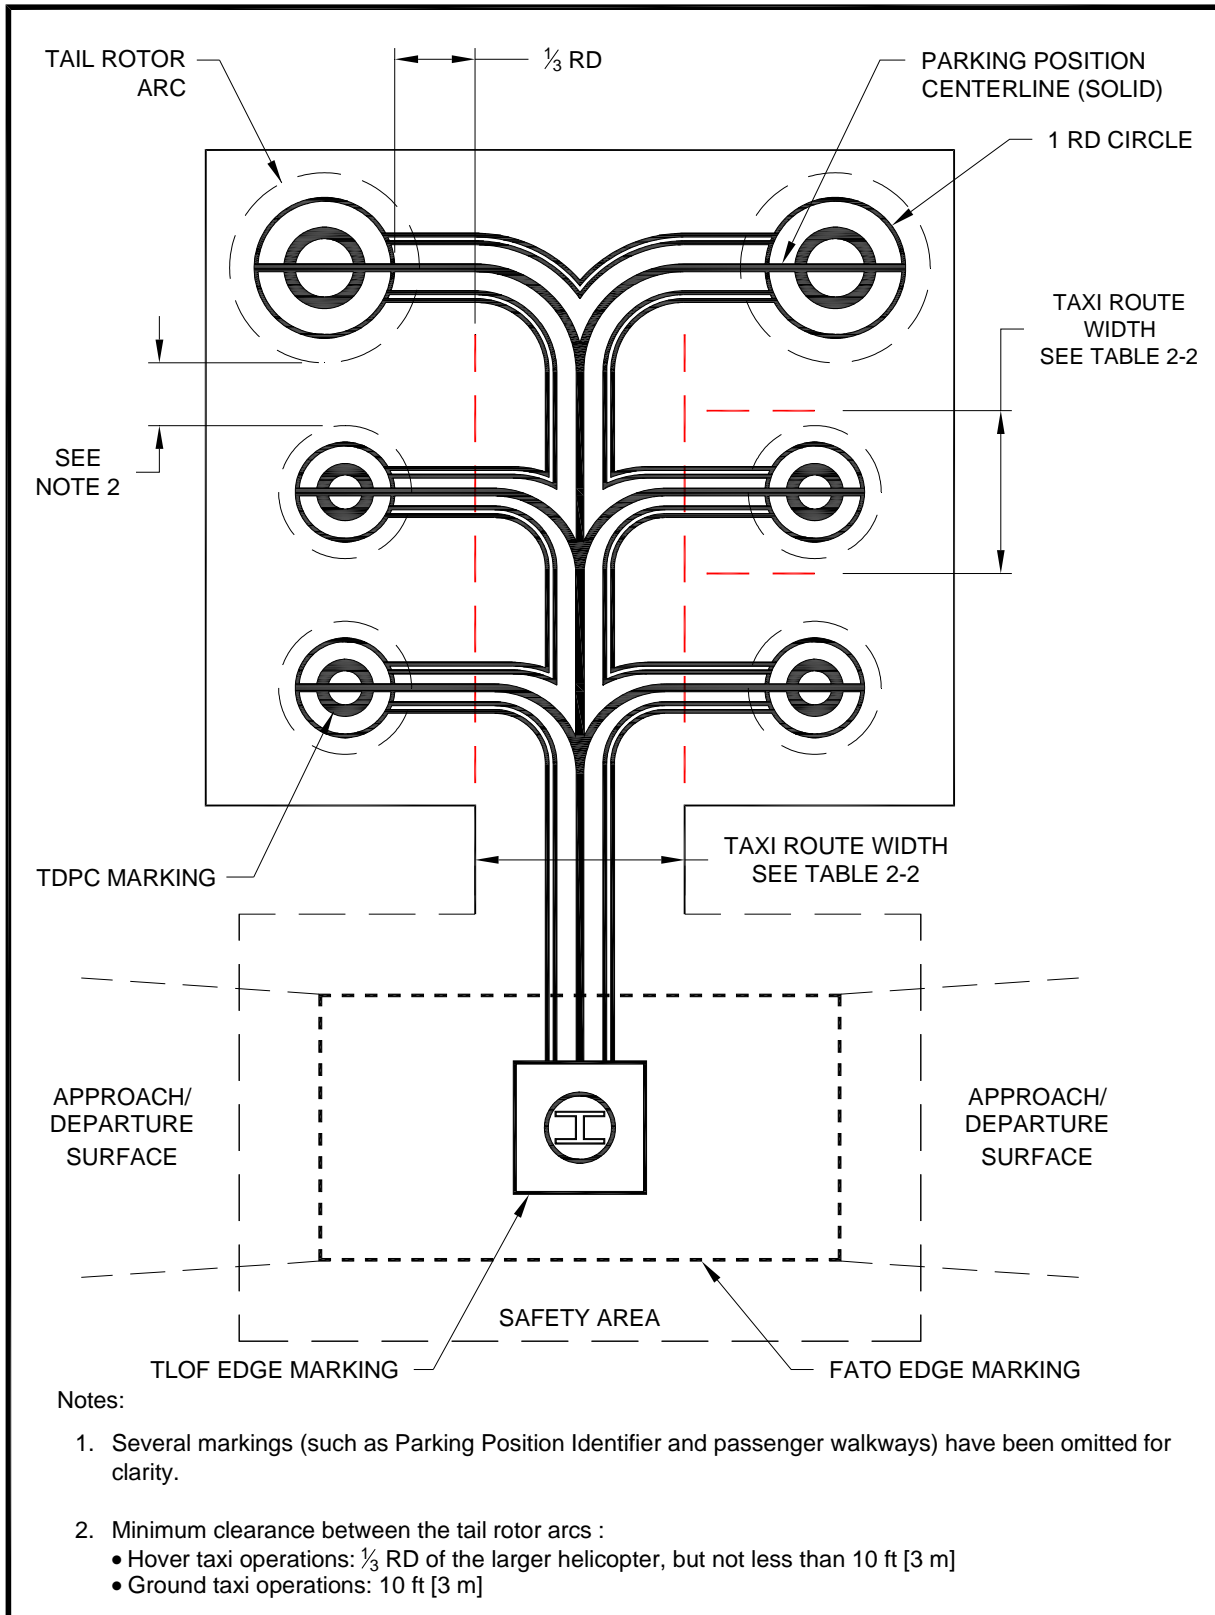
Parking Area Design – “Turn-around” Parking Positions: Transport
